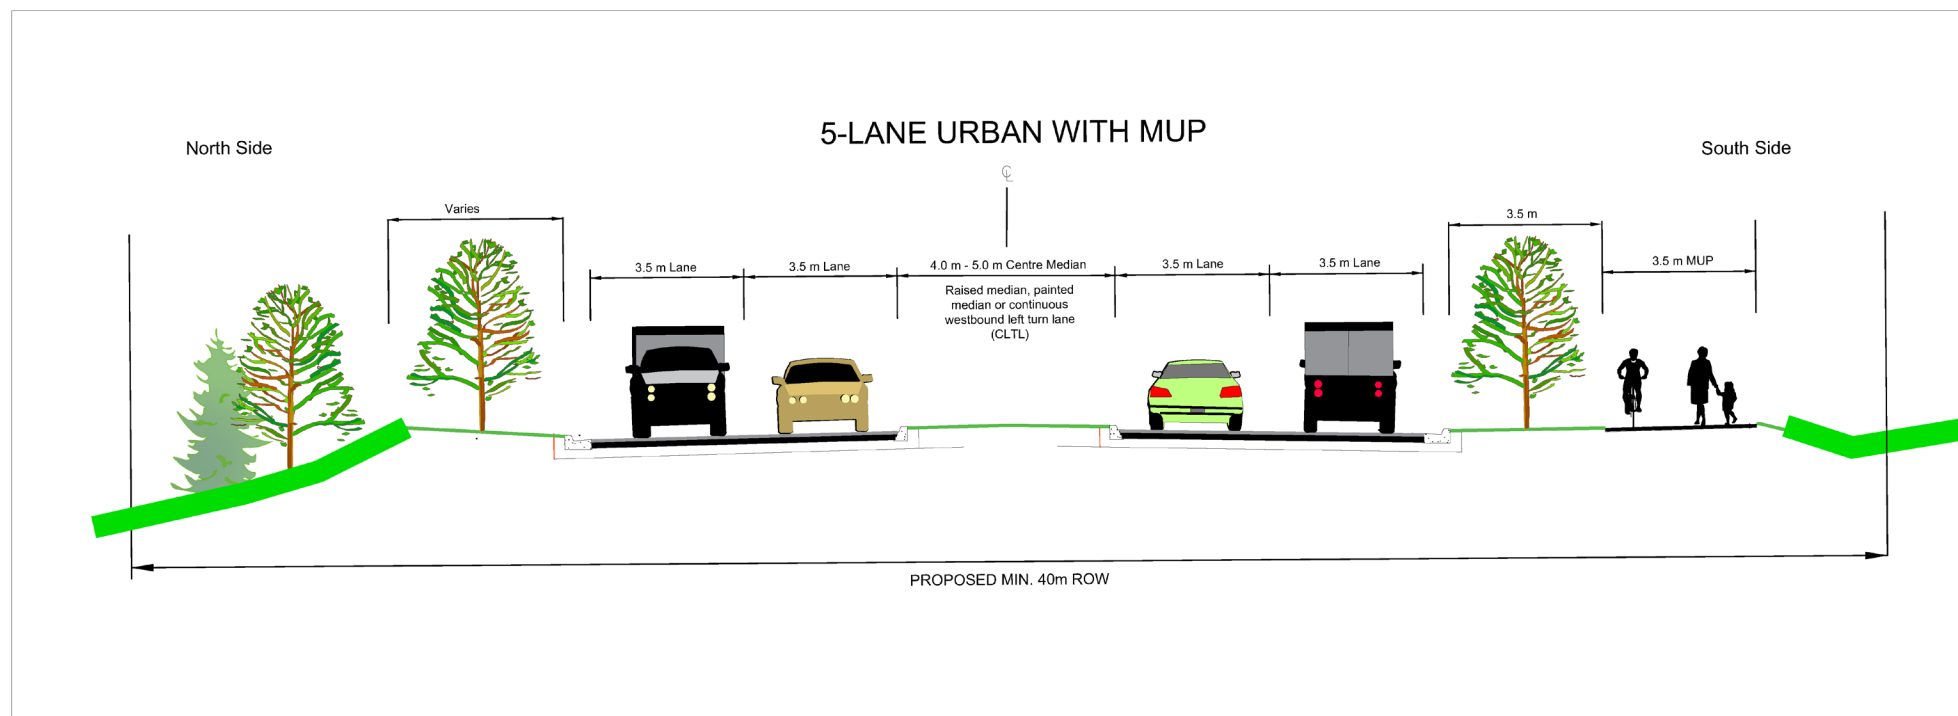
Preliminary 5-Lane Cross Section Alternatives - Colborne Street West
